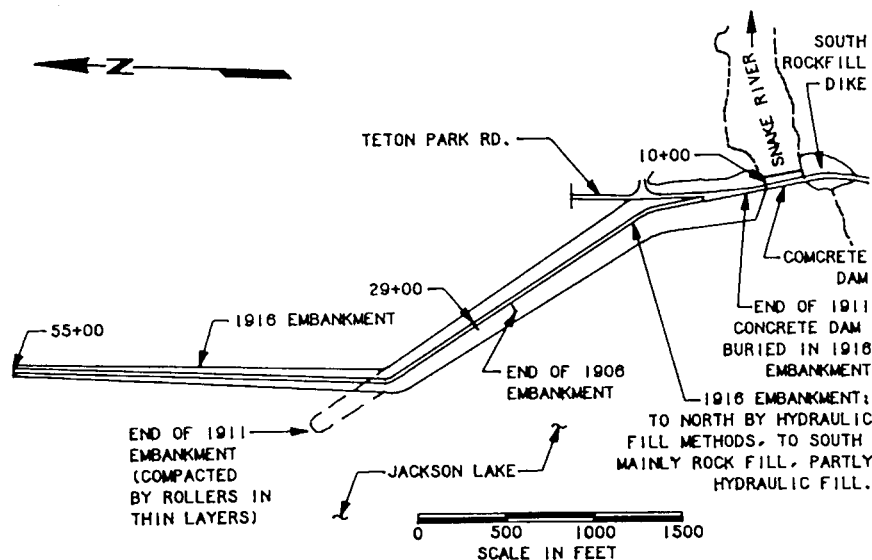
Schematic plan view of Jackson lake Dam (Pujol-Rius et al., 1989)
